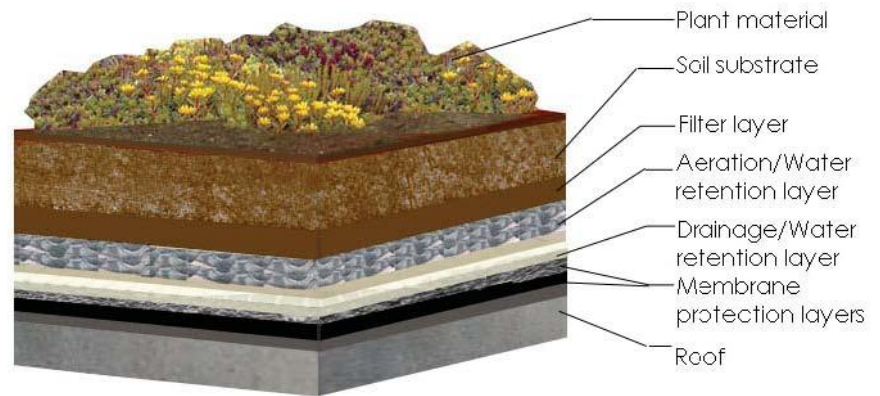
A basic cross-section of a vegetated roof (Source: New York City Department of Design & Construction [Cool and Green Roofing Manual](#))
